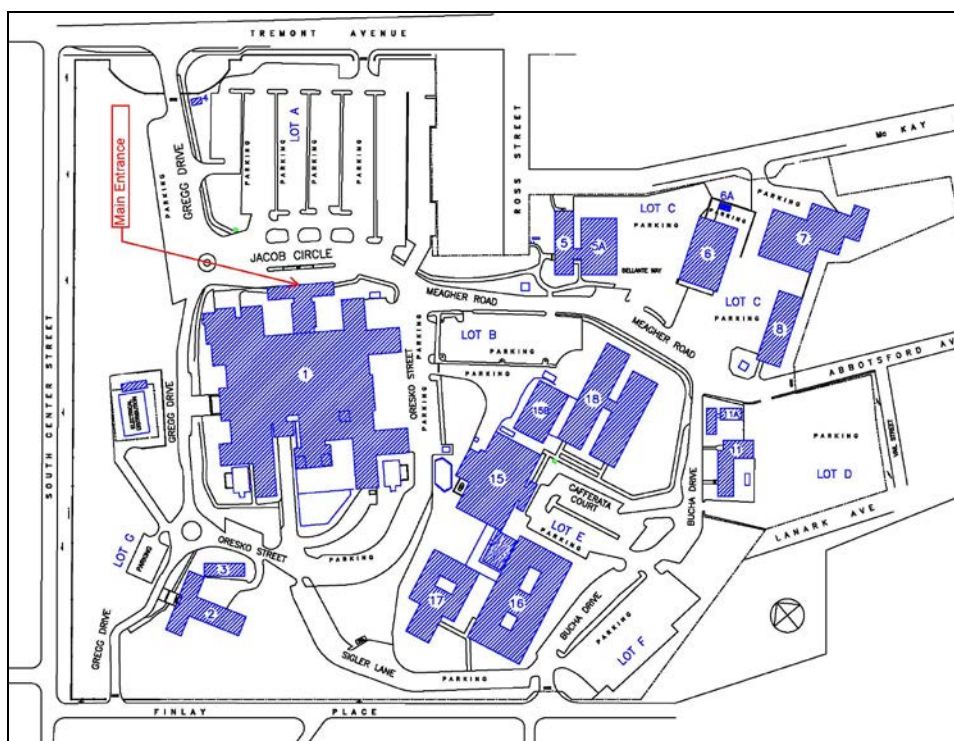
Sketch plan of the medical campus to show building footprint and site layout, 2005 (VA).
